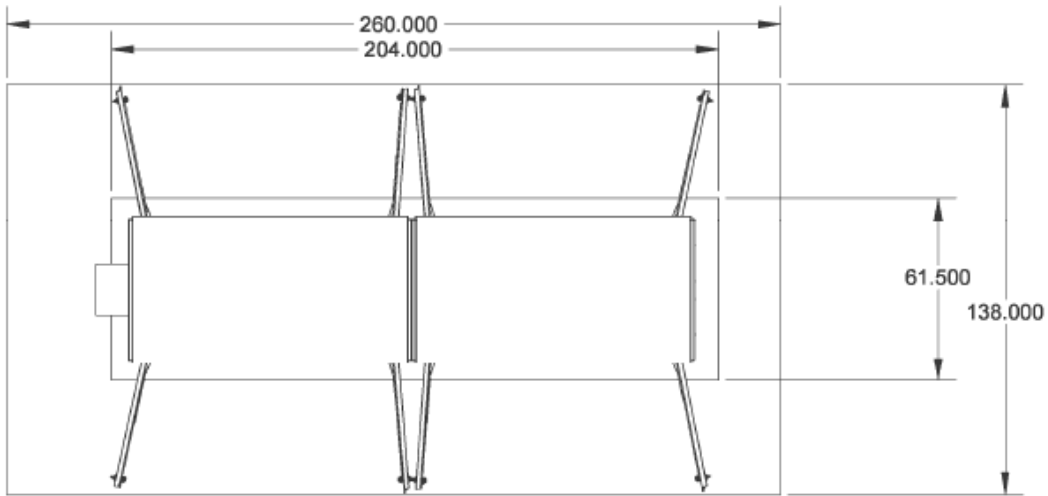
Recommended clearances and minimum foundation footprint for two-bay enclosures.
